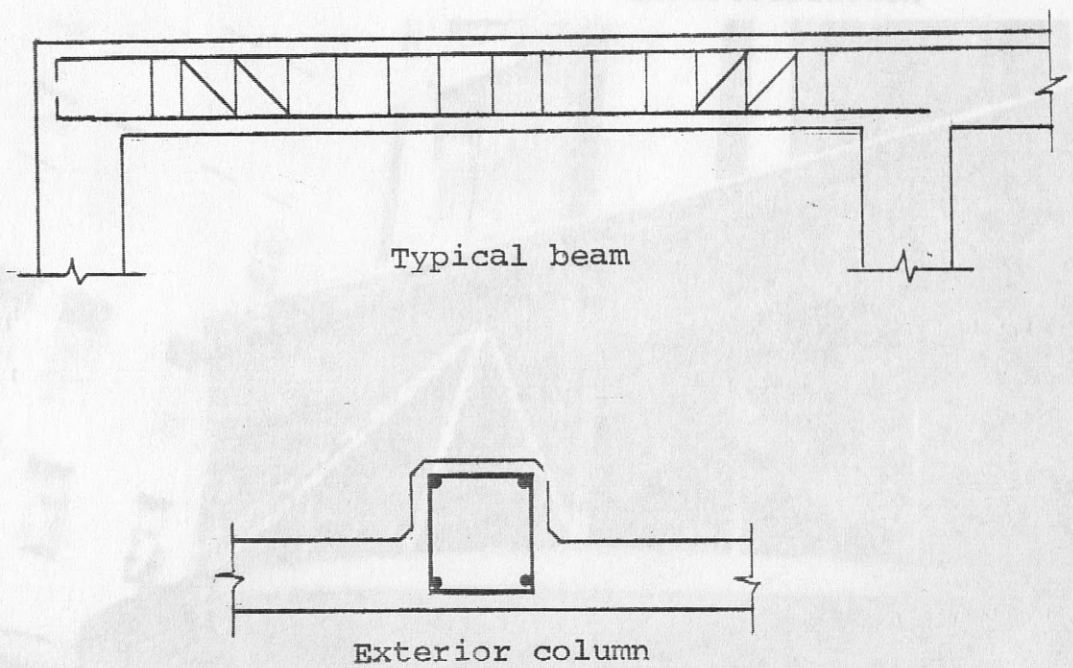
Typical Cross Section of Beams and Columns in Building C
